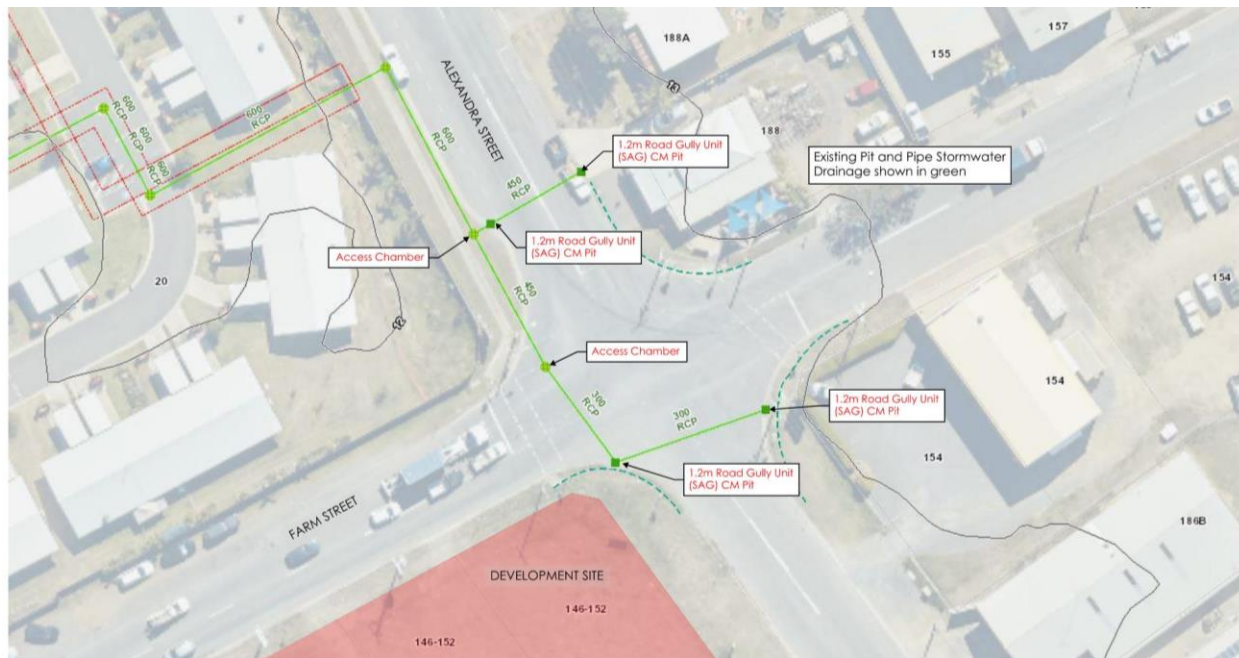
Existing Council Controlled Pit and Pipe Stormwater Drainage Infrastructure
